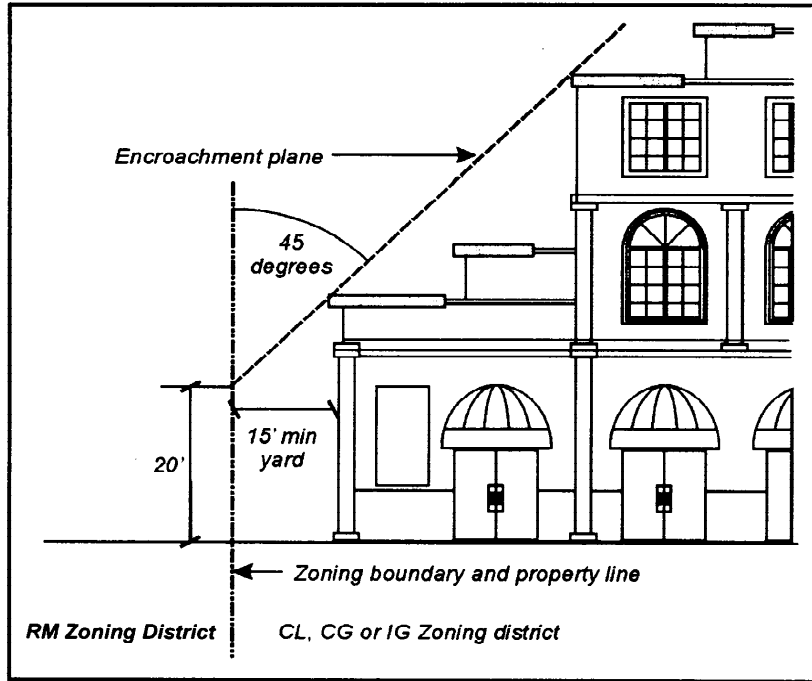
Encroachment Plane Requirements for Projects Abutting RS and RM-12 Zoning Districts
